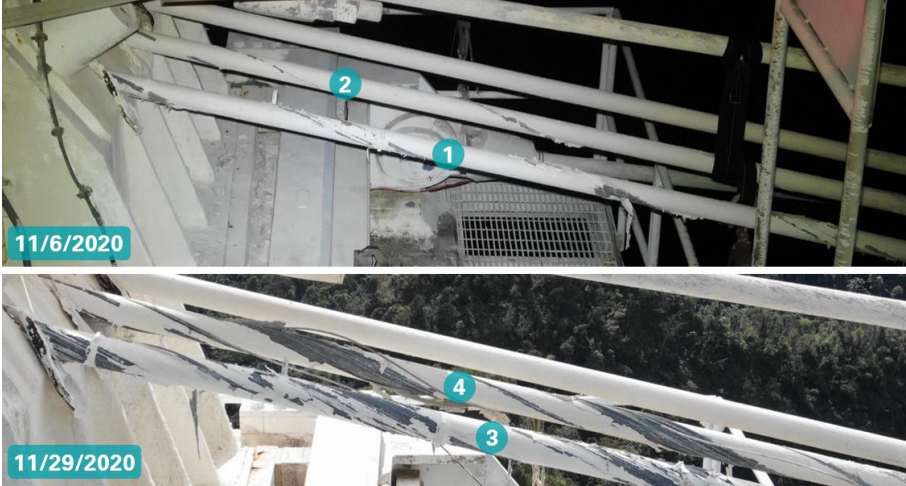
Damage on original M4 cables at top of Tower 4 after first cable failure (photos: NAIC Arecibo Observatory, a facility of the NSF).
